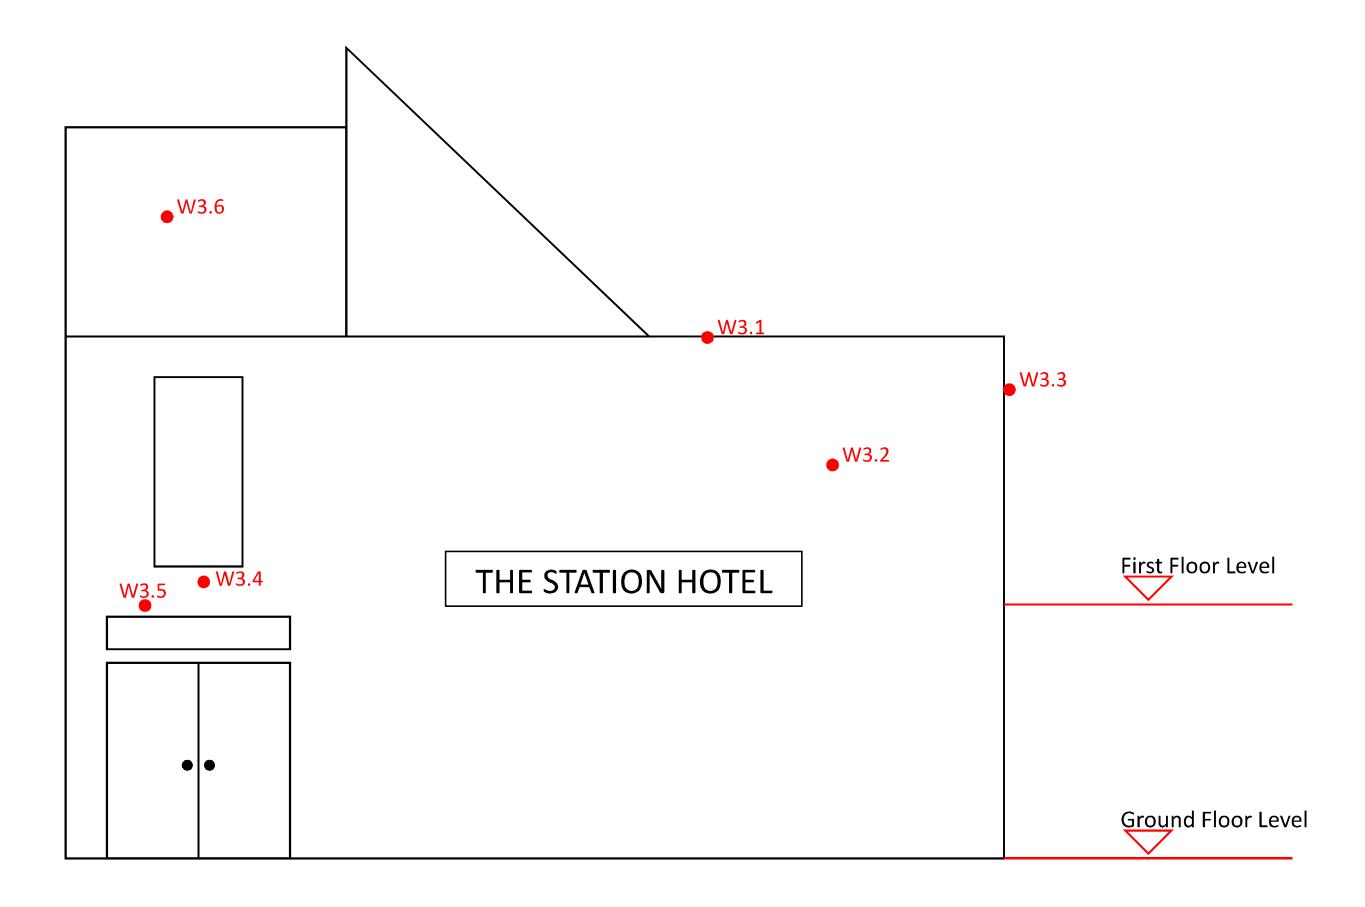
Elevation W5 of Station Hotel Building showing Defect/Observation Locations
